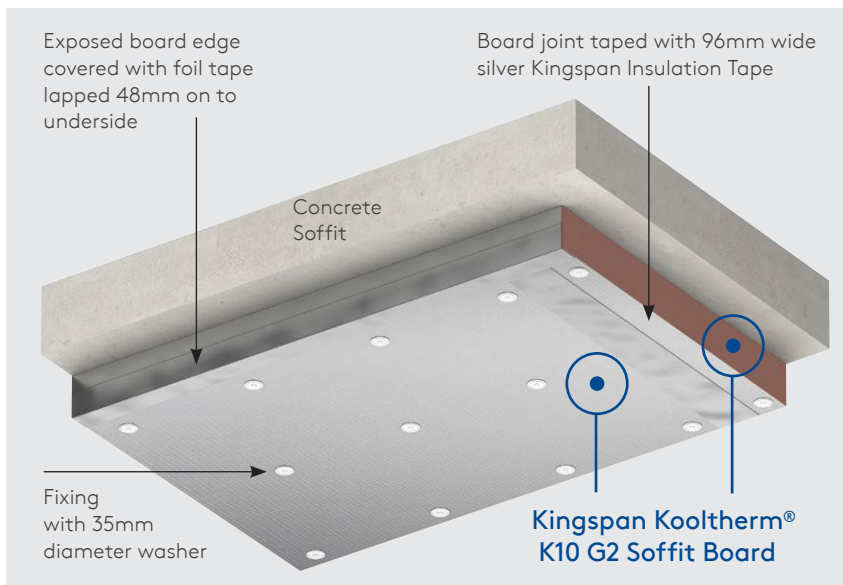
Exposed board edges are protected by silver Kingspan Insulation Tape with a minimum 48 mm wide overlap.
